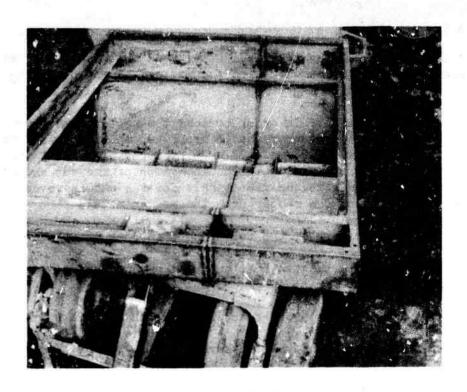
CUT OF ROLLER BODY NECESSARY FOR LOADING
